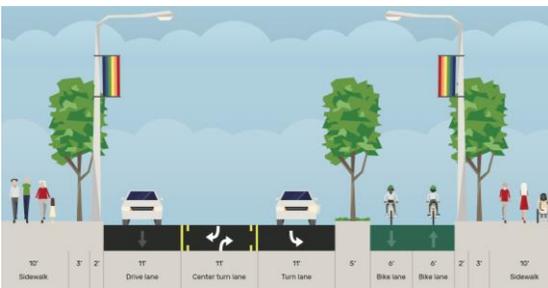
State Route 20 Proposed Cross Section with one travel lane, and center left-turn lane (Made with Streetmix)
